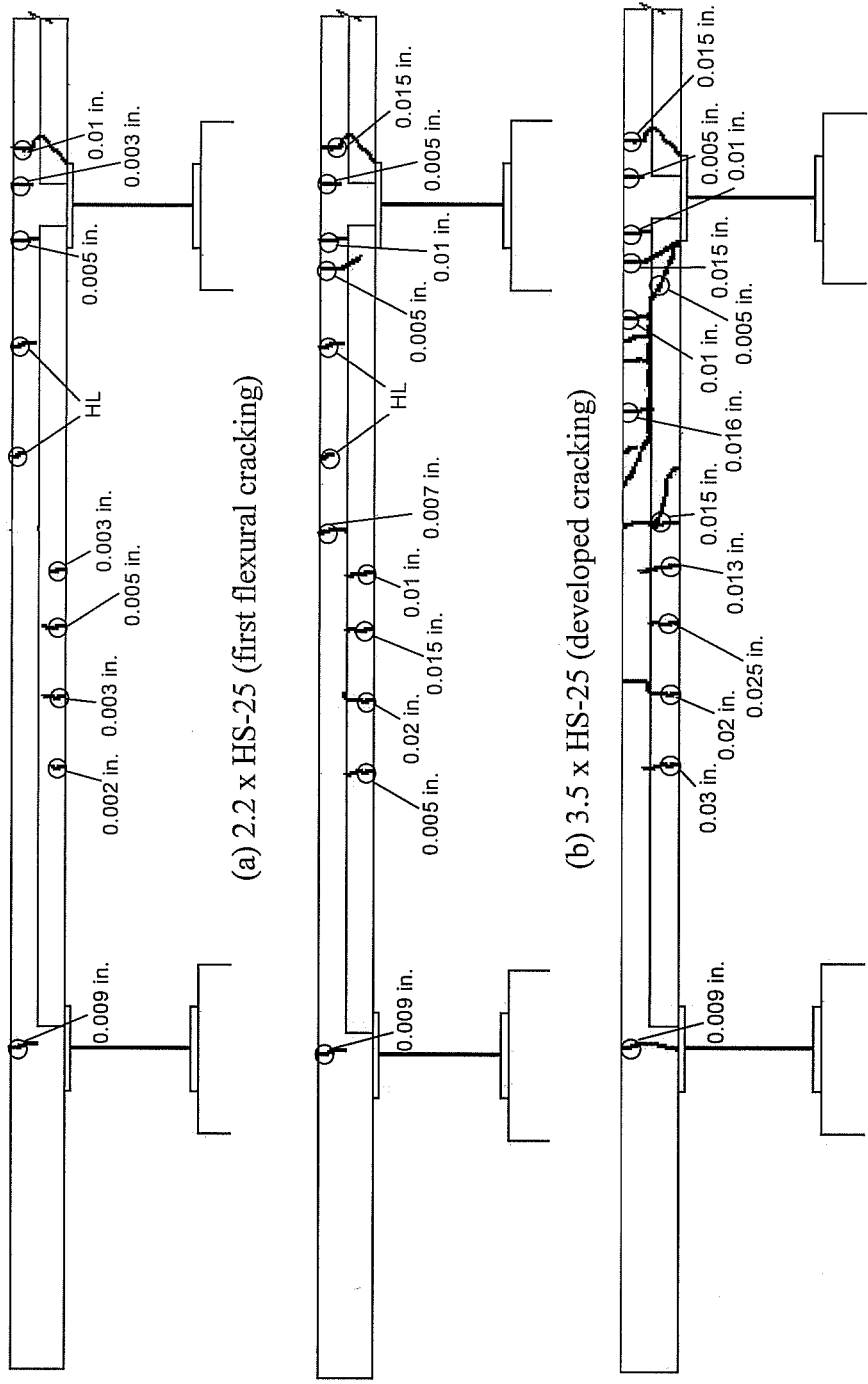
Crack map, 6 in. top reinforcement spacing, positive-moment region, side view of slab
